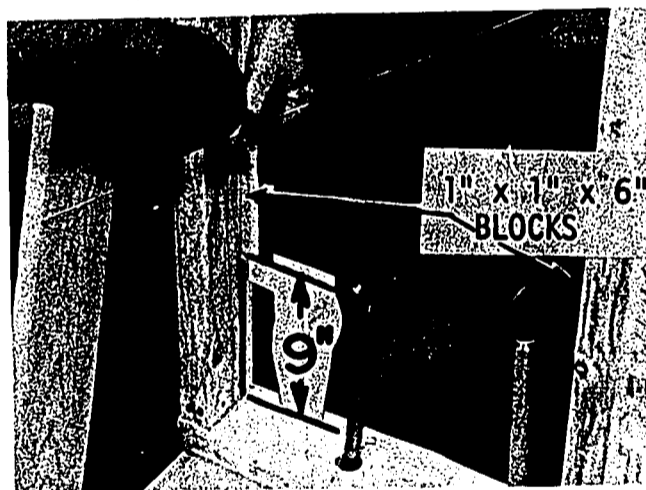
Installing Blocks for Backing Boards (5" nipples are removed.)
